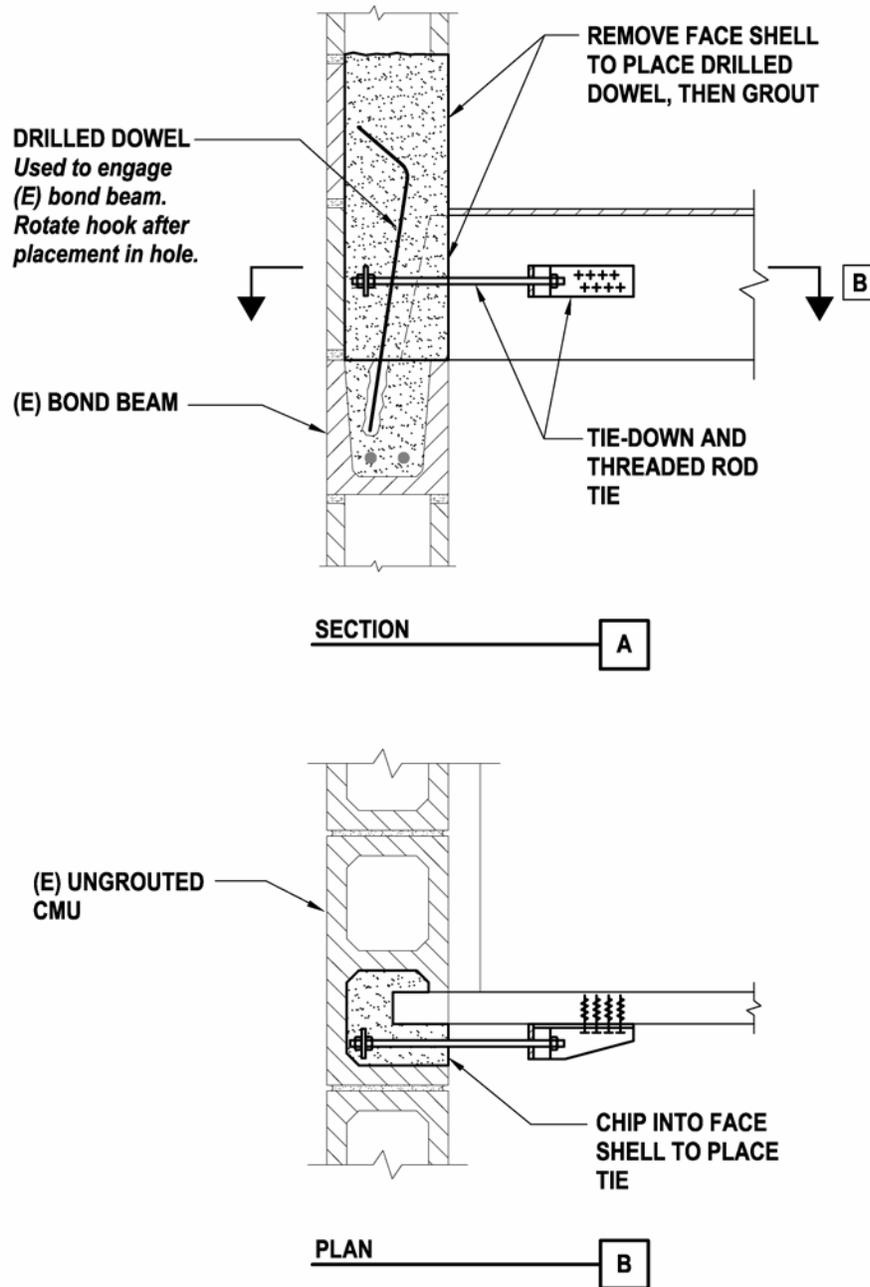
Wall-to-Floor Tension Tie in Hollow Masonry
